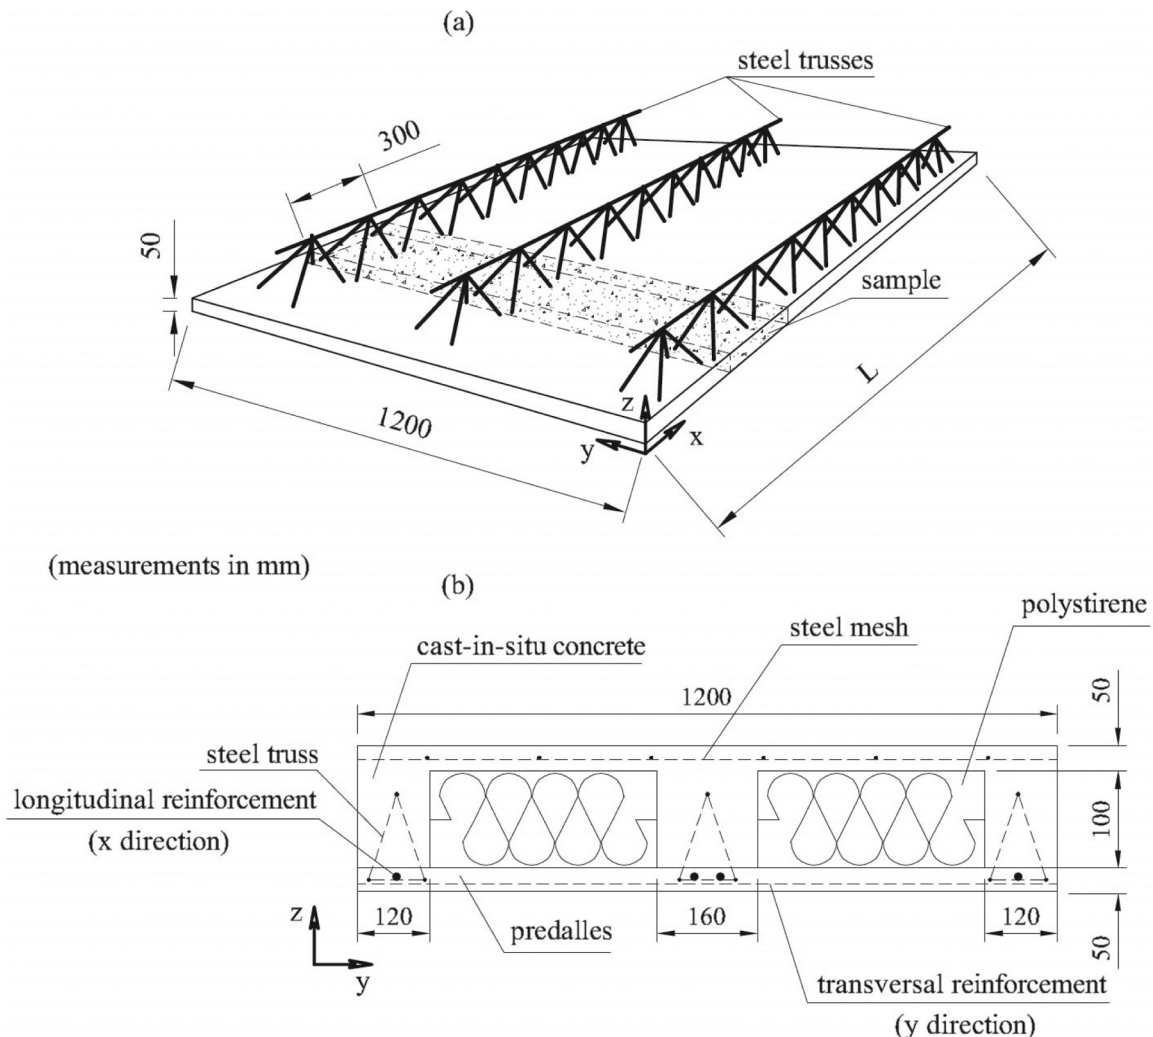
Partially precast slab of floors: (a) precast predalle; (b) typical cross-section of a slab.
